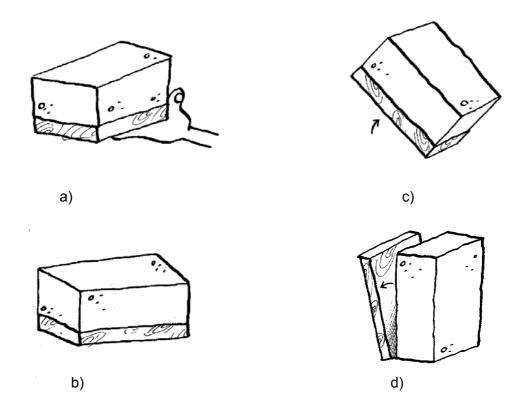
Block handling after manufacture: a) The block just after pressing, b) The block should be laid for the first 24 hours, c) After 24 hrs. the block should be folded, and d) The wooden piece should be then removed
